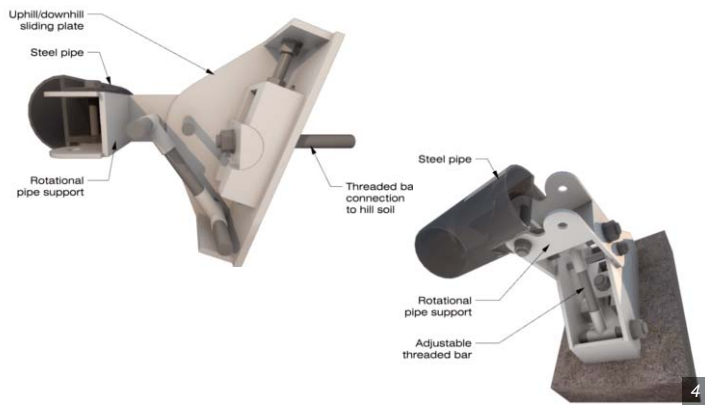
Detailing the connections and supporting structures © Maffei Engineering
